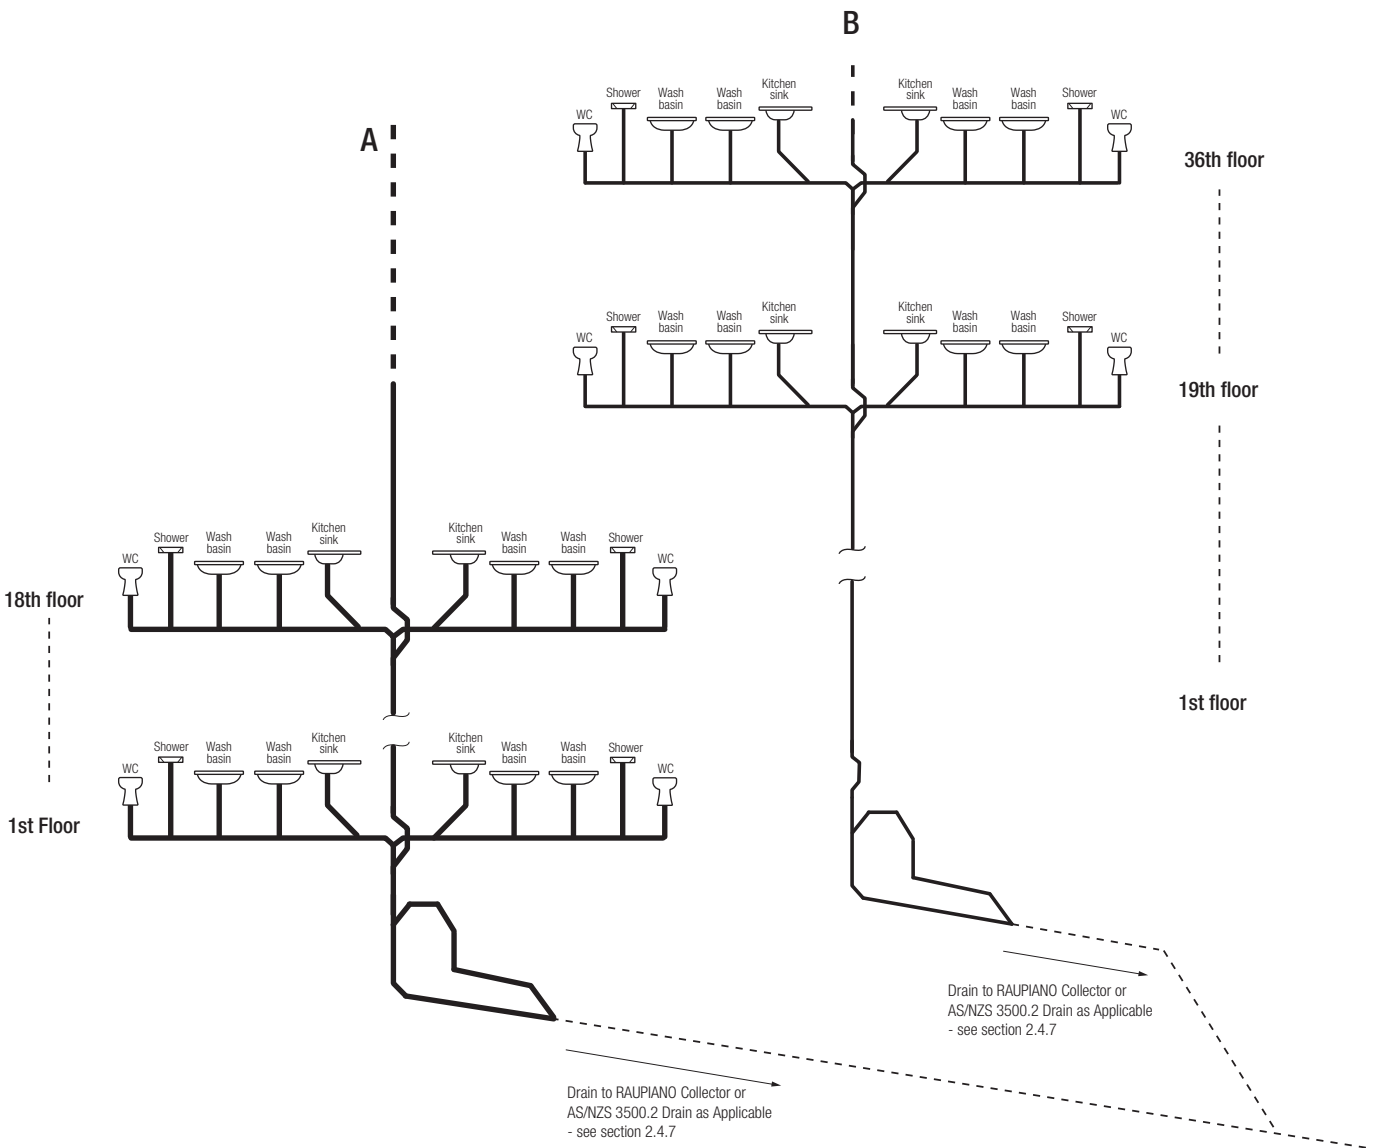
RAUVENT RVASS drainage plan – Example 2
